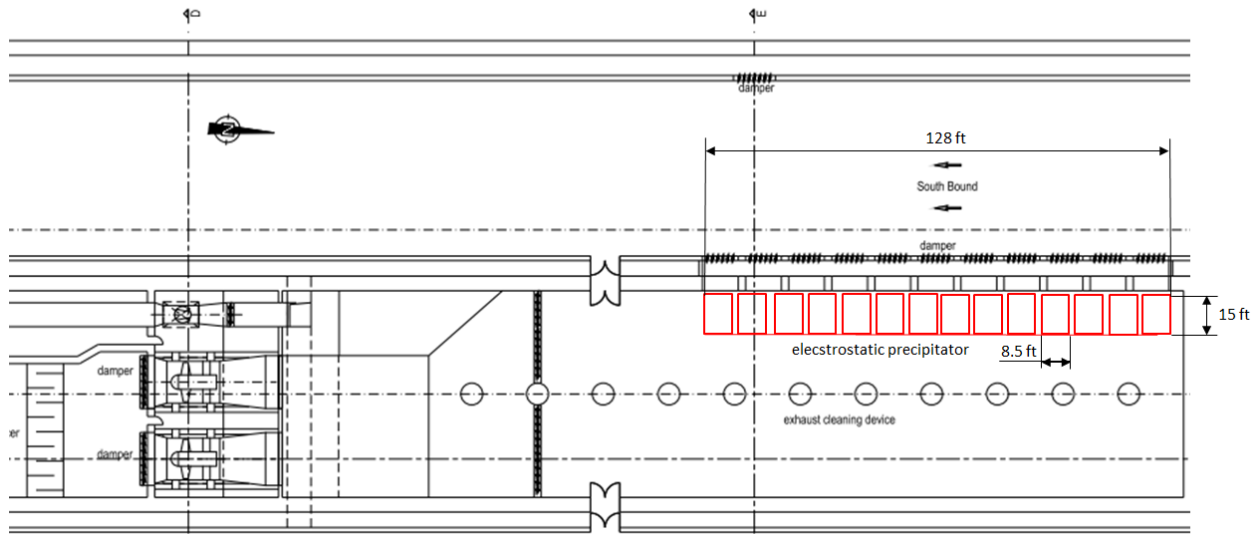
Spacing of EP Air Cleaning Equipment, Portal Building South, Plan View
